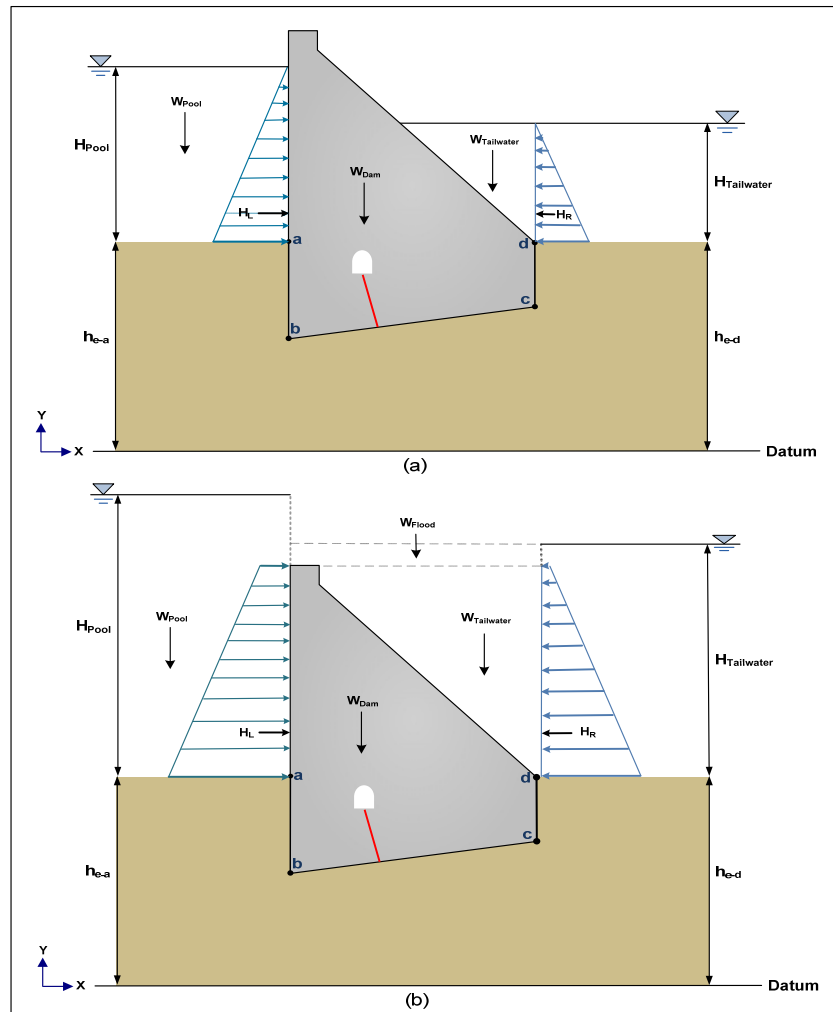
Loading of structural wedge model of the embedded concrete gravity dam with rock foundation drain (a) pool and tailwater below crest (b) pool and tailwater above the crest of the dam.
